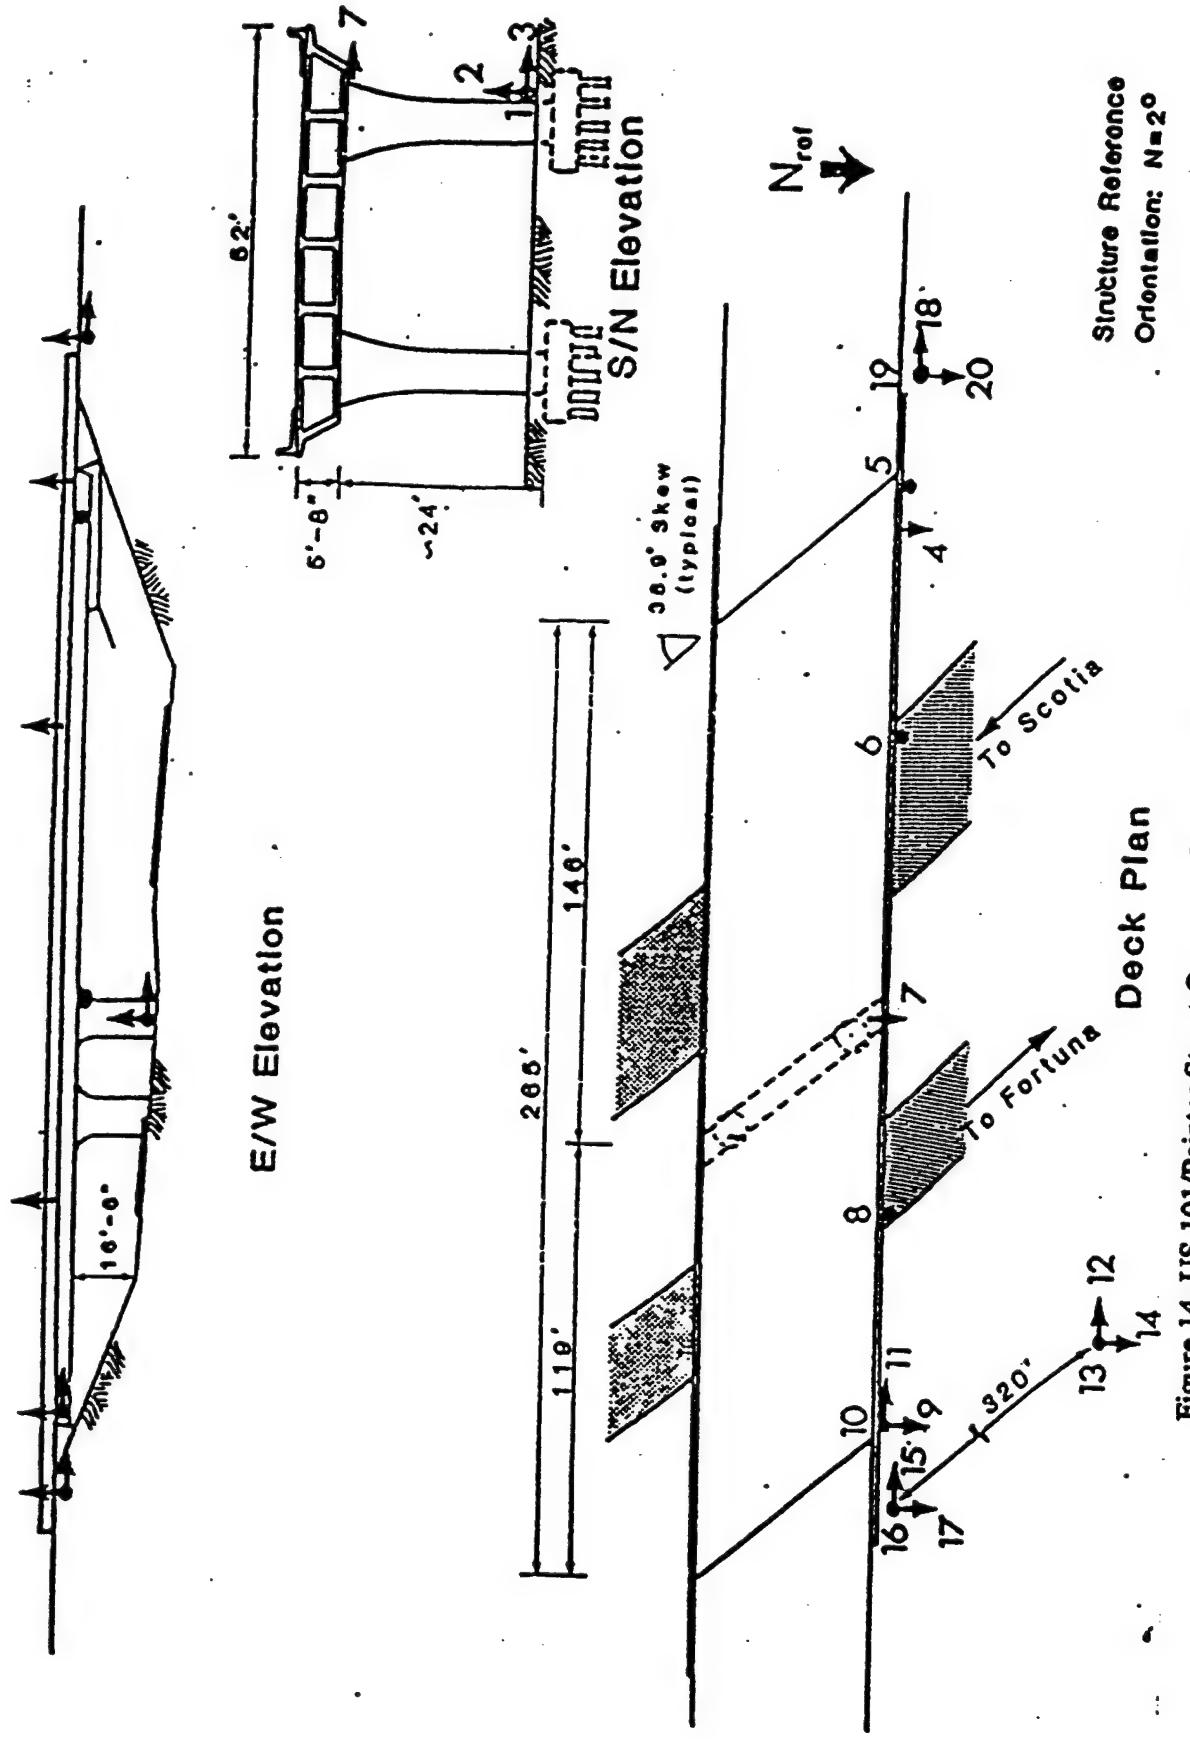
US 101/Painter Street Overpass: Structural Details and Instrument Locations (Goel, 1995).
